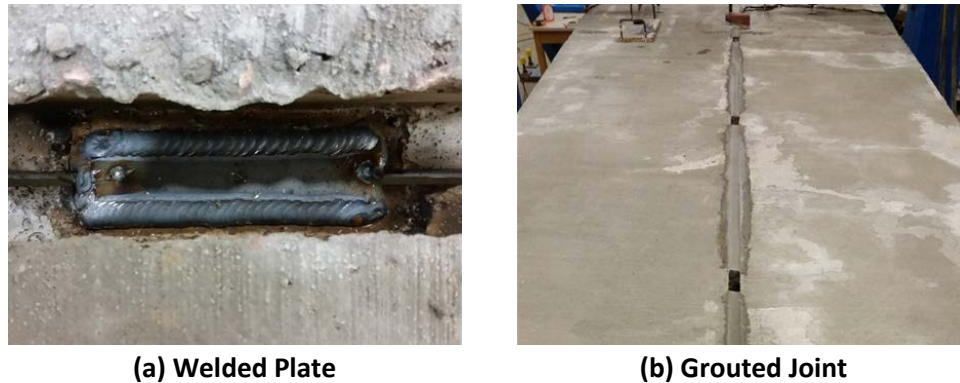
Connection at Longitudinal Joint of the “Conventional” Specimen
